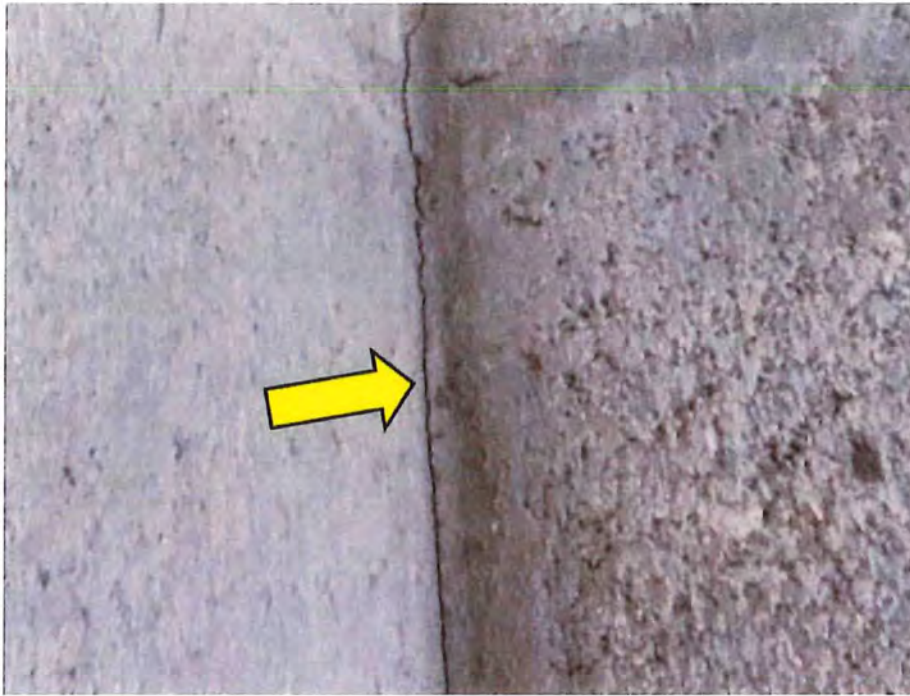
Movement and cracking of masonry wall on interior of main building
